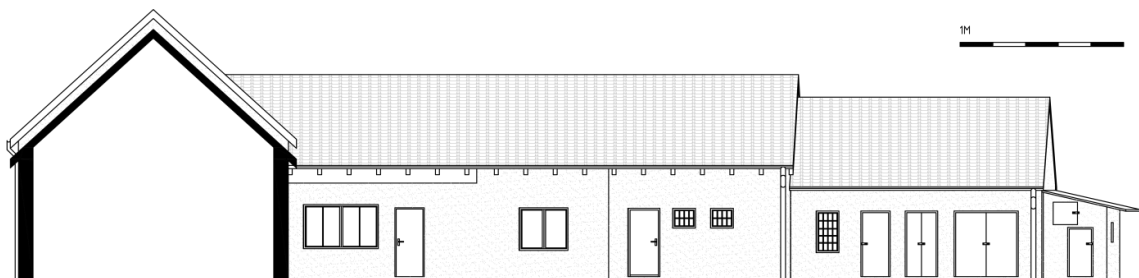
Southern elevation of the original single-family house in Přebice. Black hatching indicates neighbouring building.
